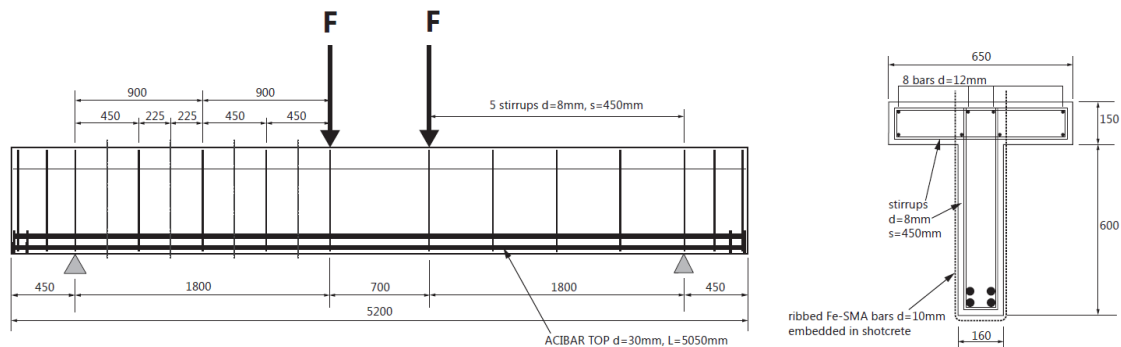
Detailed drawing of the internal reinforcement for the test beams.
